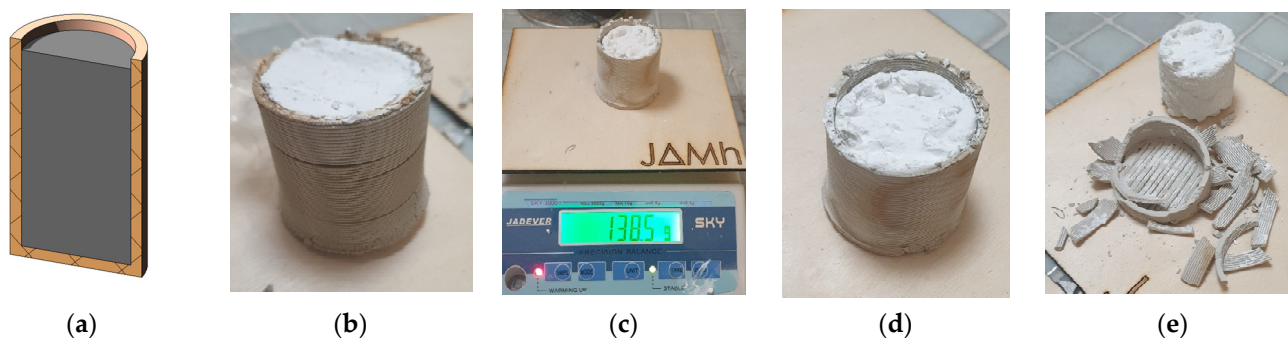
3D-printed cylinder formworks filled with cement: (a) 3D model (b) 3D-printed part filled (c) Weight measurement (d) Visual test (e) Final stripping.
